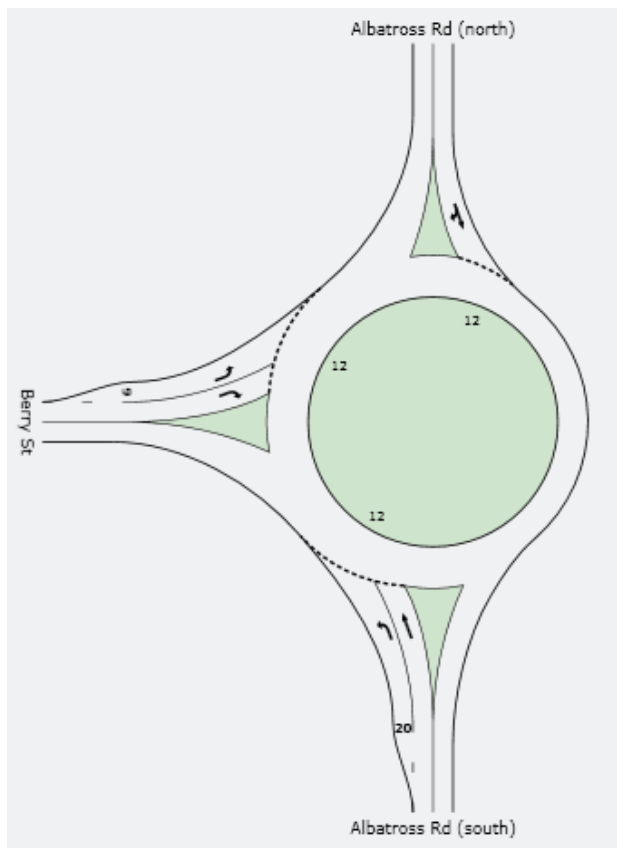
Albatross Road / Berry Street Proposed Intersection Configuration
